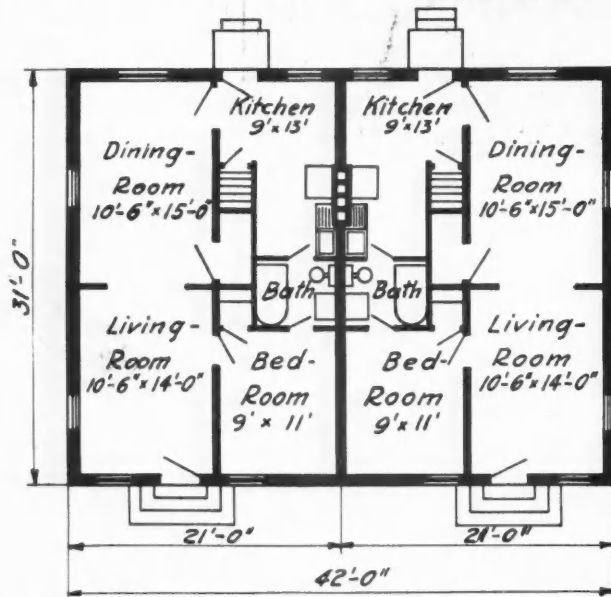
Floor Plan of a Double Drake House at Omaha. The Plan of the Single House Is Similar to Either Side of the Double-House Plan.
